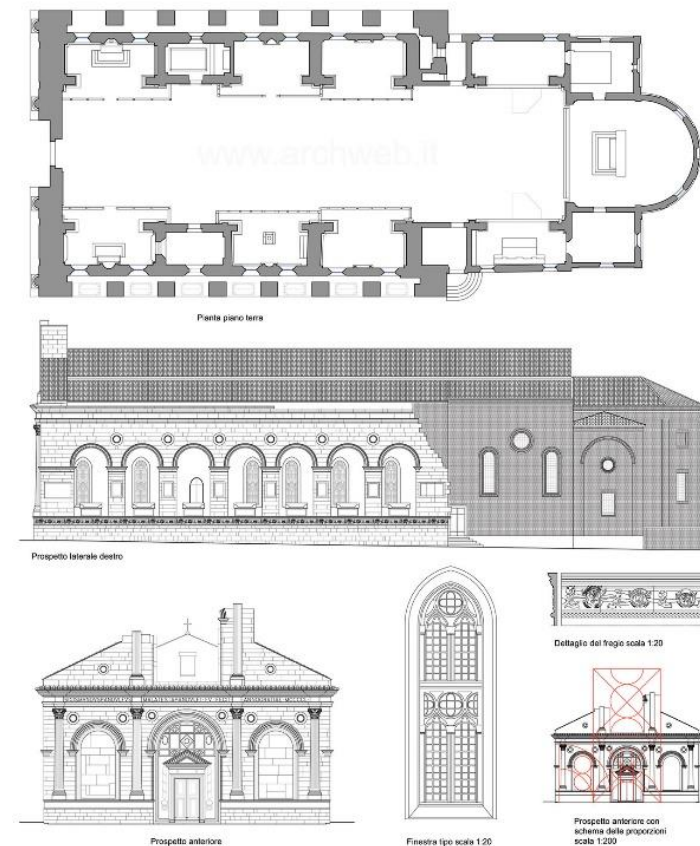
Tempio Malatestiano in Rimini. Floor plan, facade and its details
